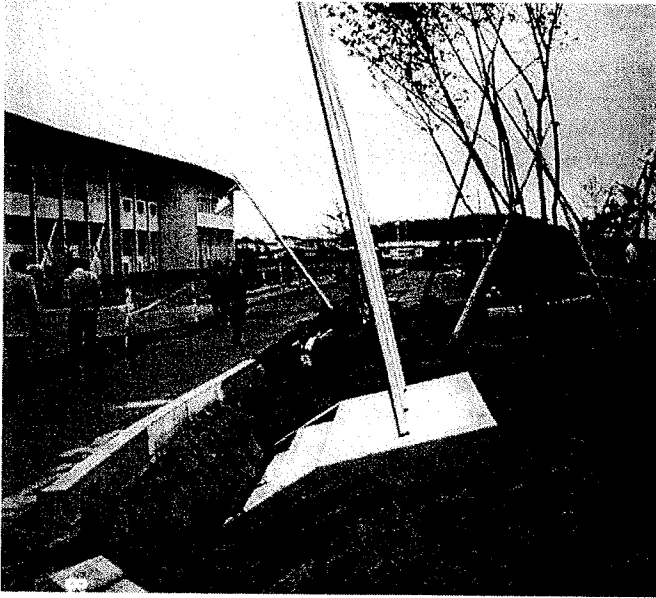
1983 Nihonkai-Chubu: Liquefaction caused unstable soils to fail. Flagpole foundation in foreground was placed shallowly. School building to the left was founded on a pile foundation and suffered no damage.
